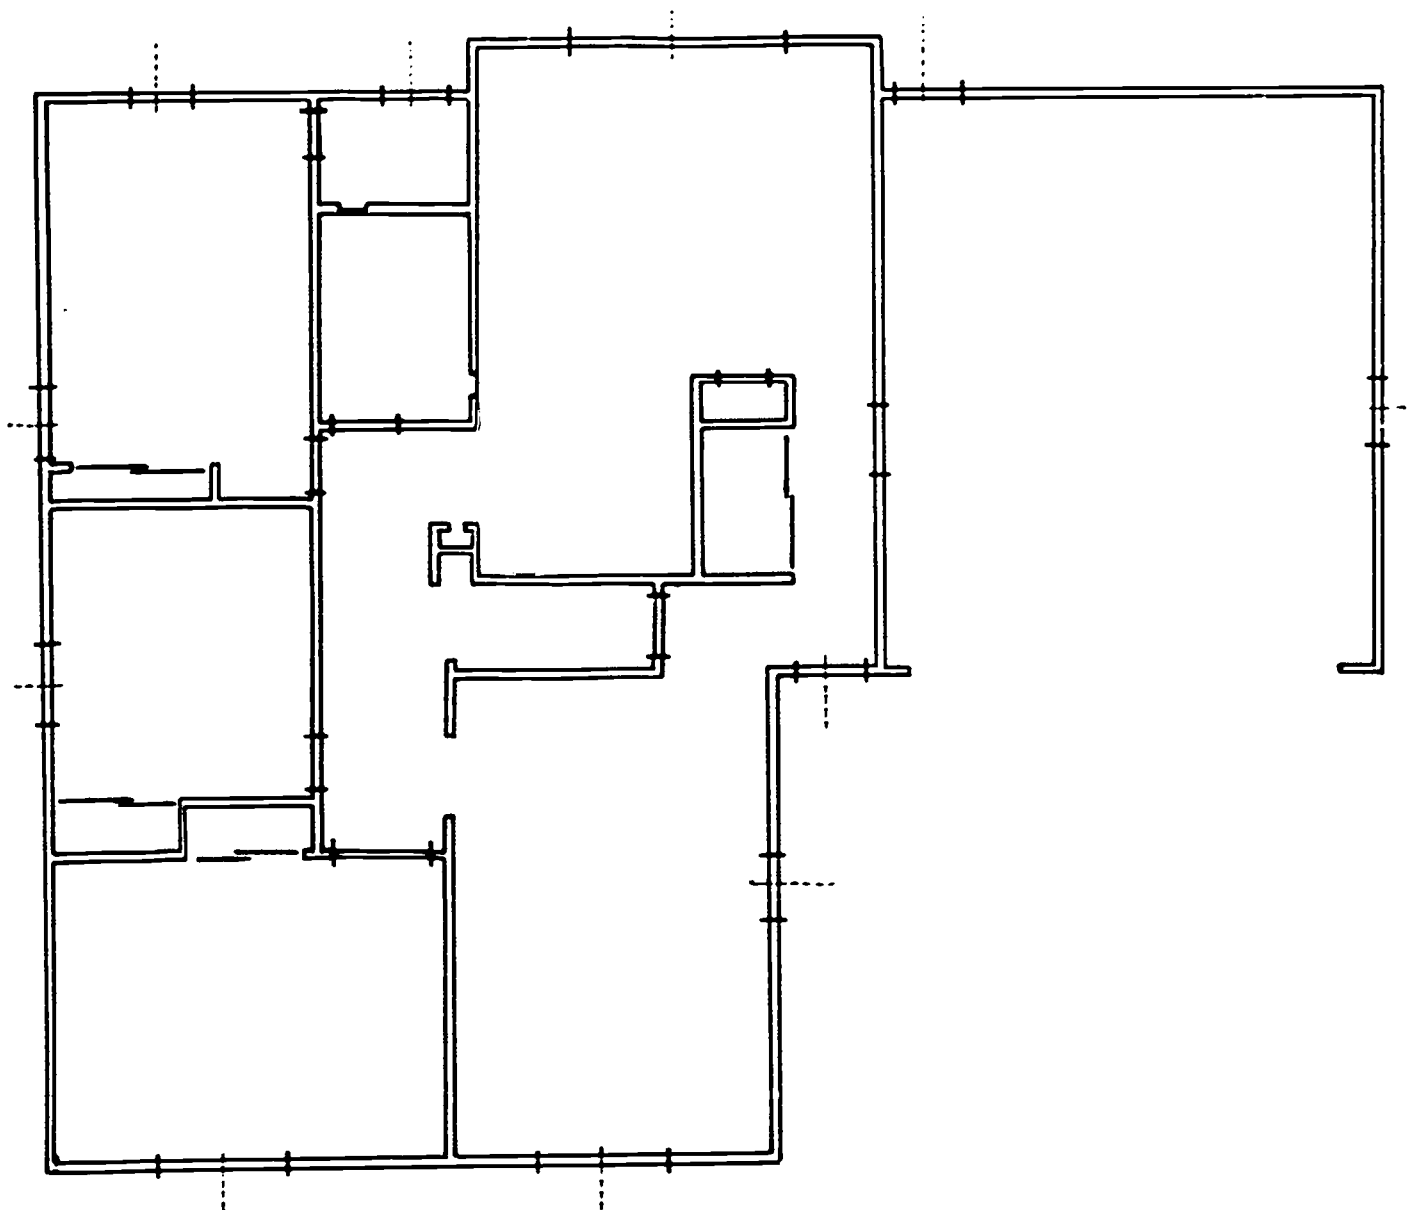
B-1. Floor Plan Showing Locations of Doors and Windows
